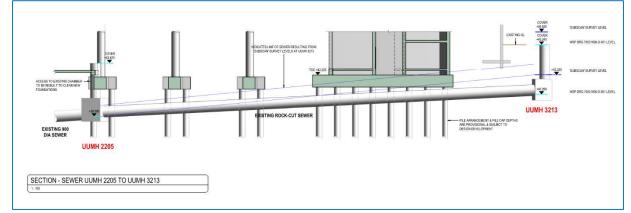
Elevation of Sewer relative to piled foundations for sewer adjacent to the A6 Viaduct (14113-WSP-SKZ-F1-DR-S-3002).
